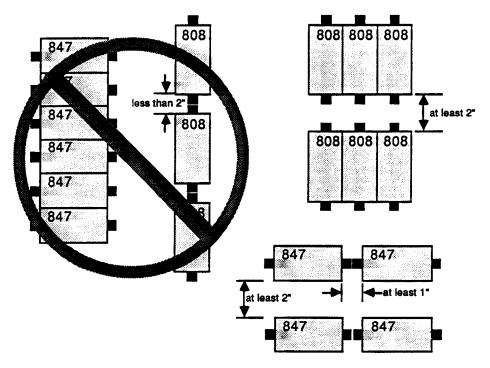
Multiple installation configurations to be discouraged (left), and suggested installation configurations (right).
